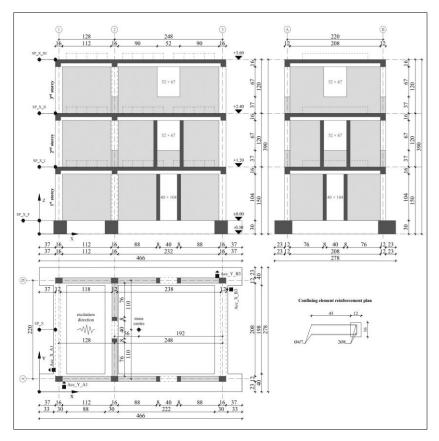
Longitudinal (top left), transverse (top right) and instrument plan views of the Series 2 build. (All dim. in cm) [25]
